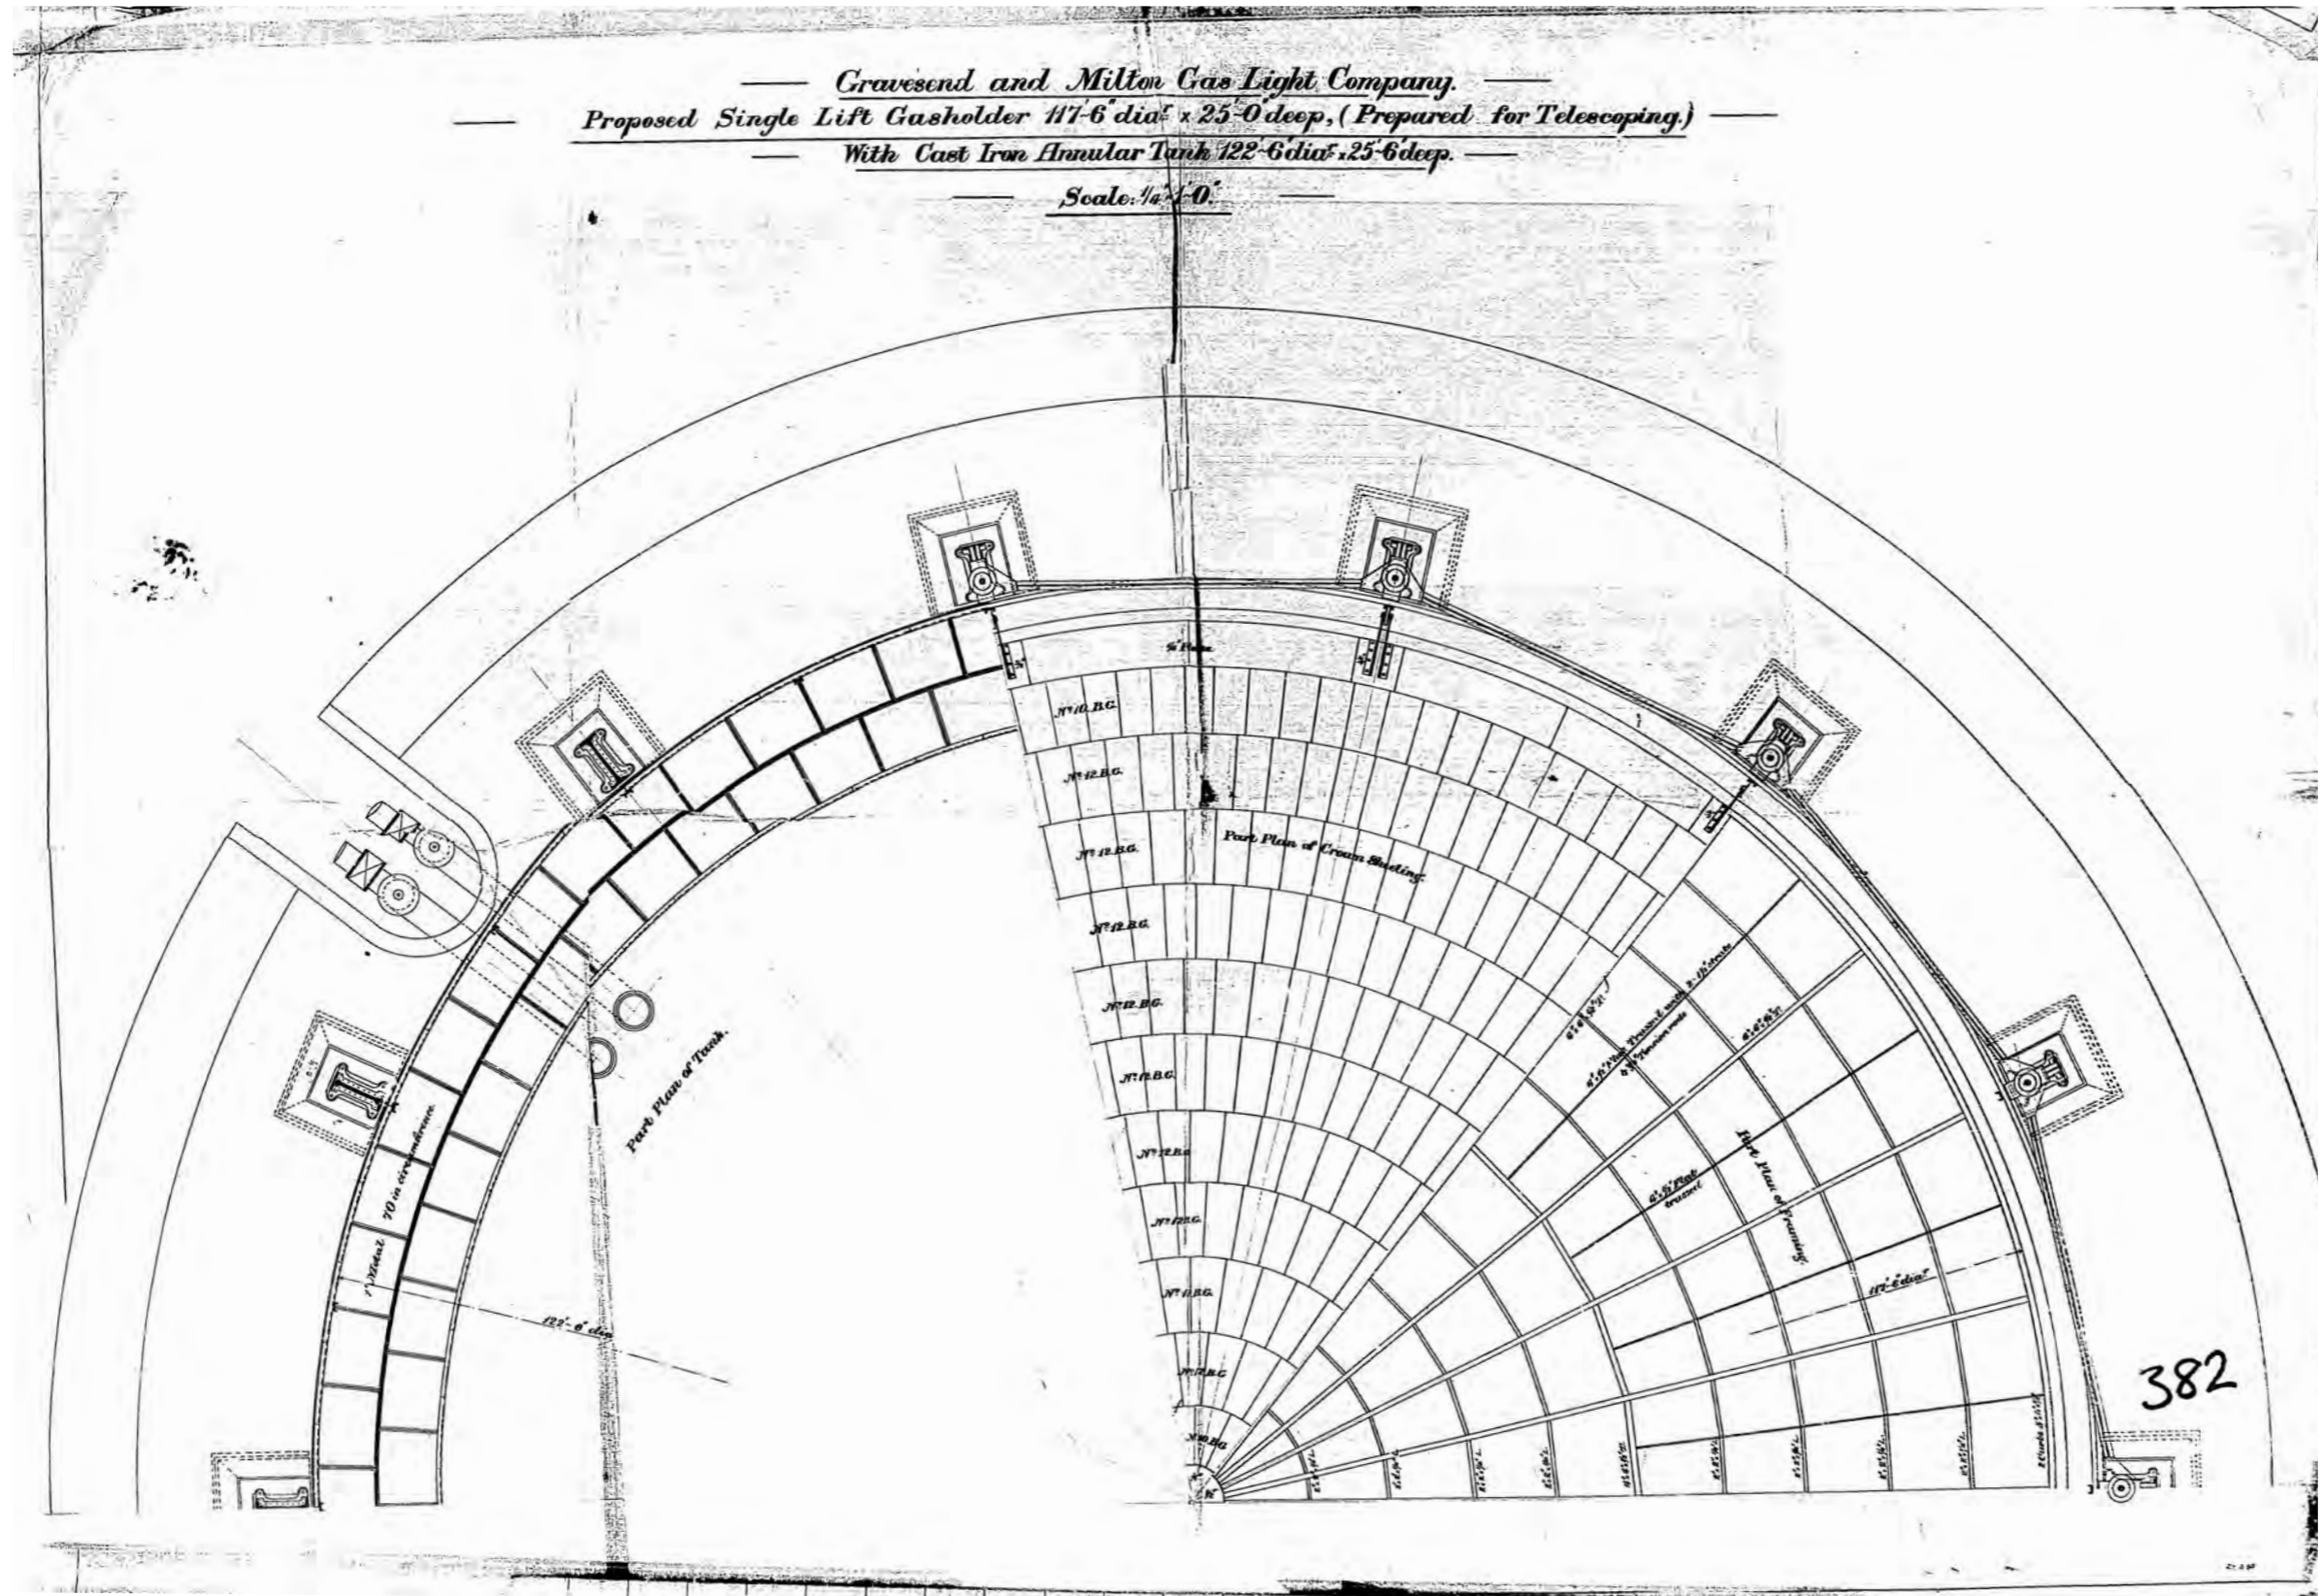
Gasholder No 1, Canal Road, Gravesend, Archive Drawing of Plan of Tank, Crown and Crown Framing (SGNA: 382)
